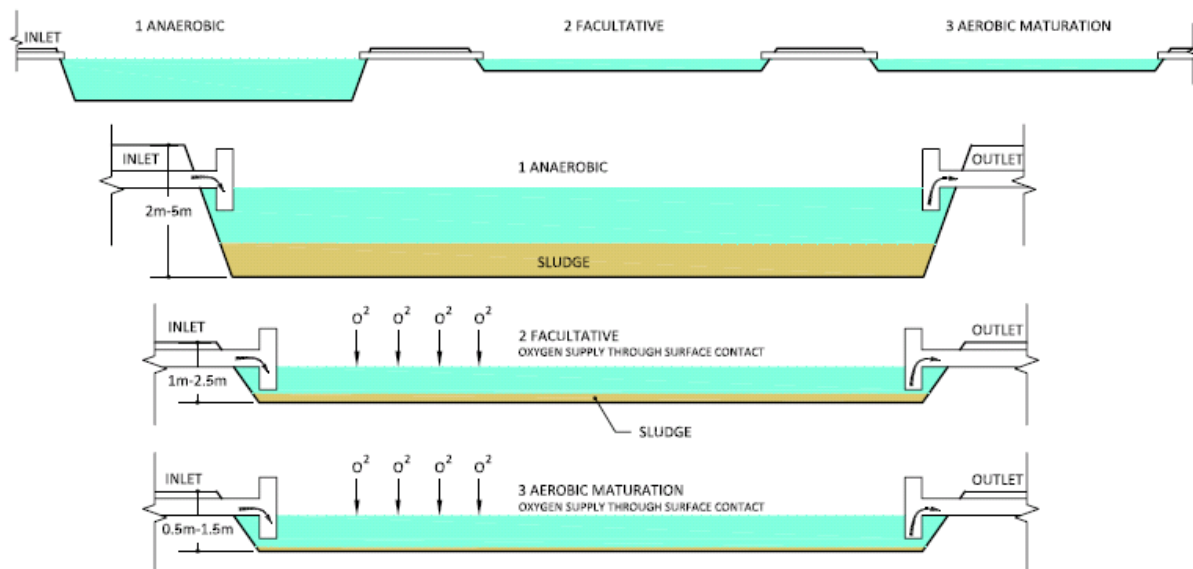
Multi-Pond Waste Stabilization System (After Tilley, 2008)
